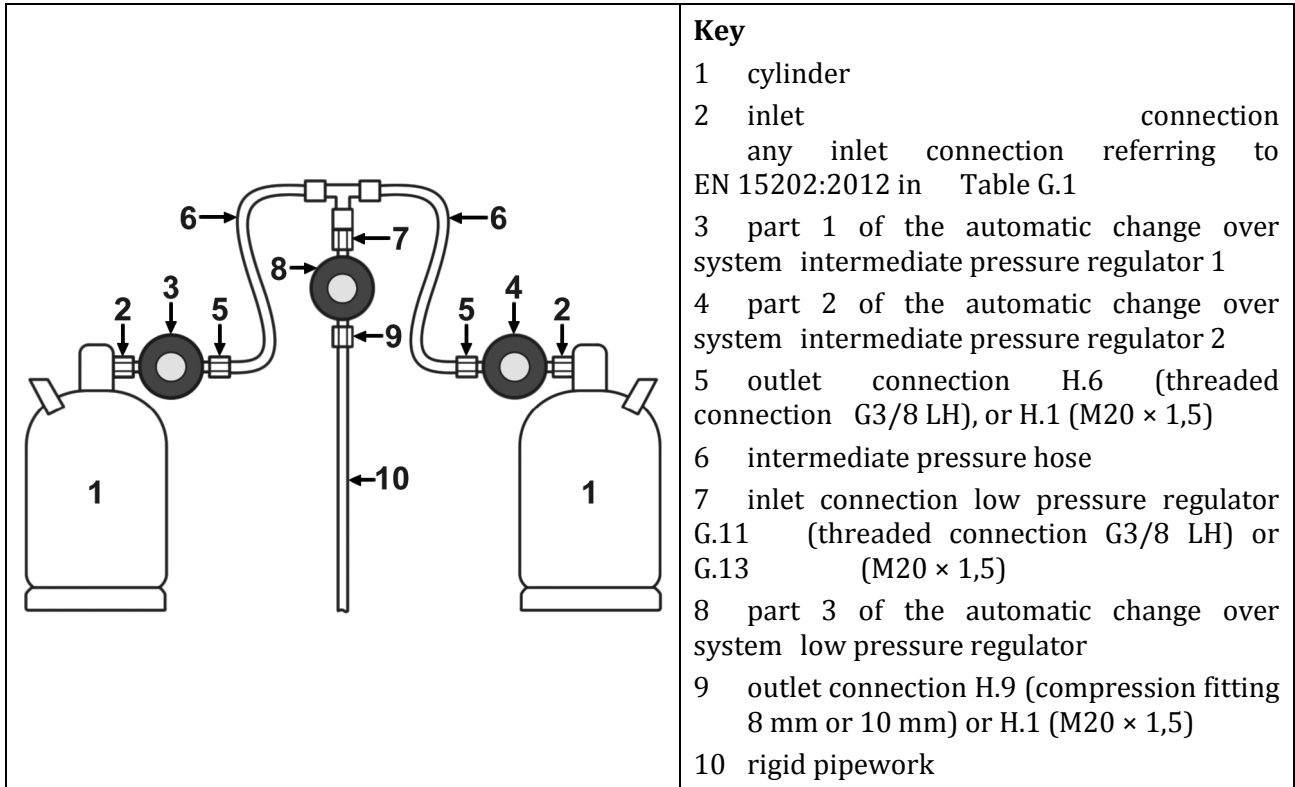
Cylinder mounted automatic change over system (type 2)
